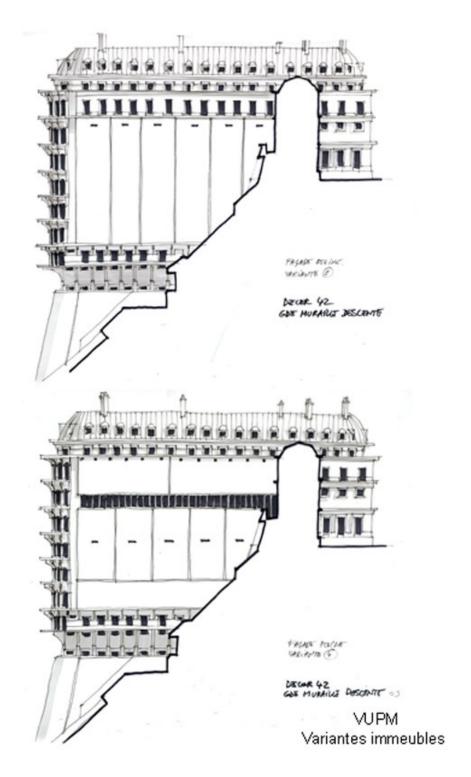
Elevation of buildings with the big wall, variants. Ink and pentone on tracing paper
